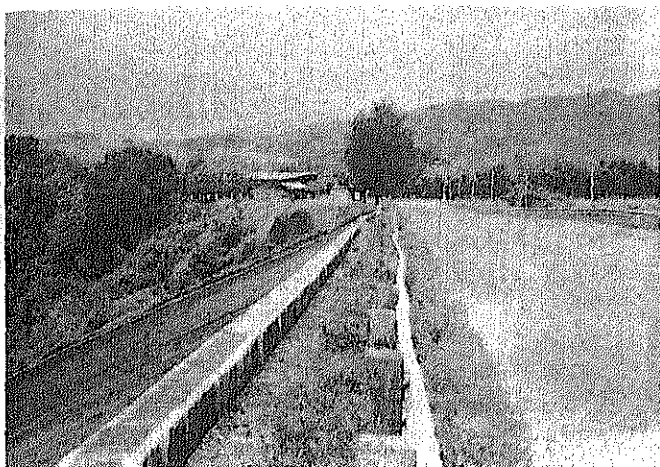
Settlement of the crest of the Pantabangan Dam
